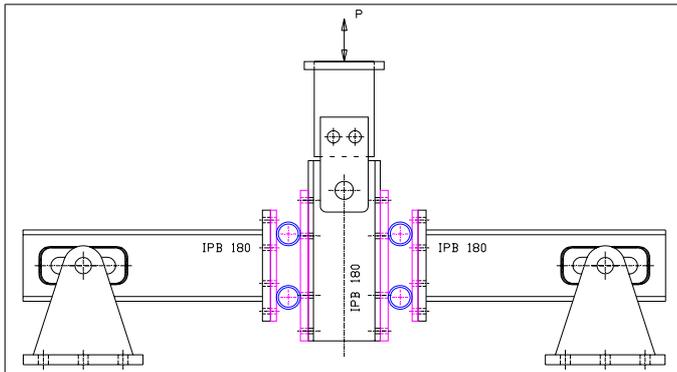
The test assembly designed and fabricated to enable the authors to apply cyclic loading to the specimens of the connection through UTM. IPB180 is a mid-weight wide flange section with 180 mm height and 180 mm width, based on DIN standard.
